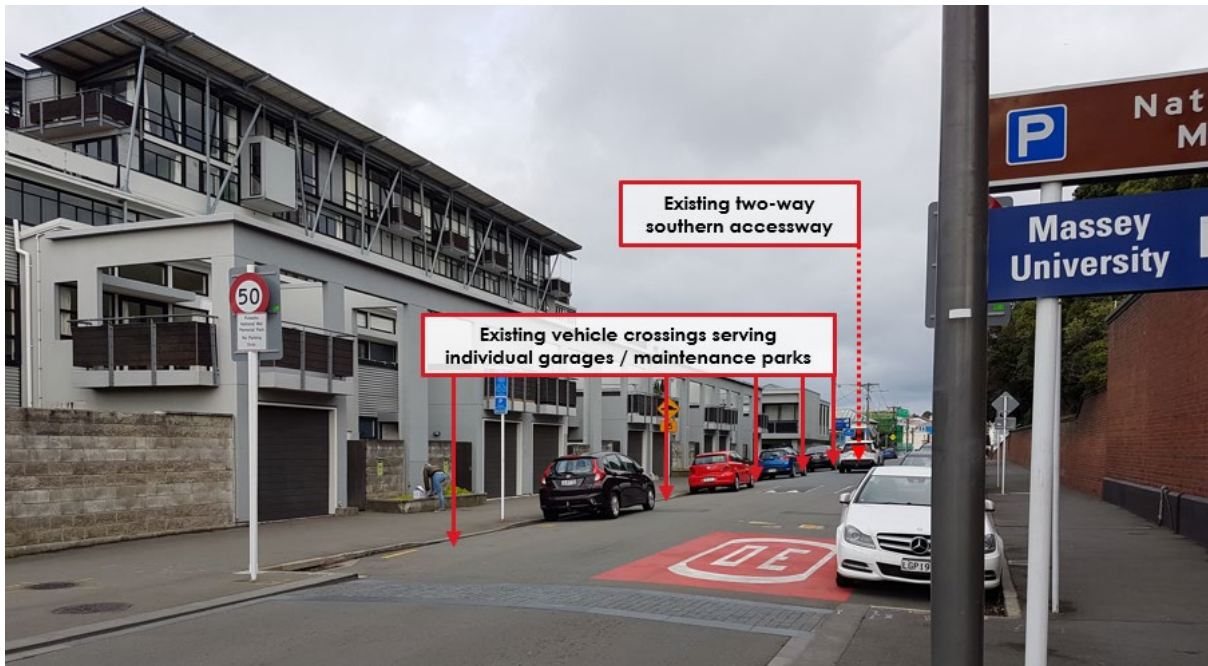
Existing Site Vehicle Crossings on Tasman Street
